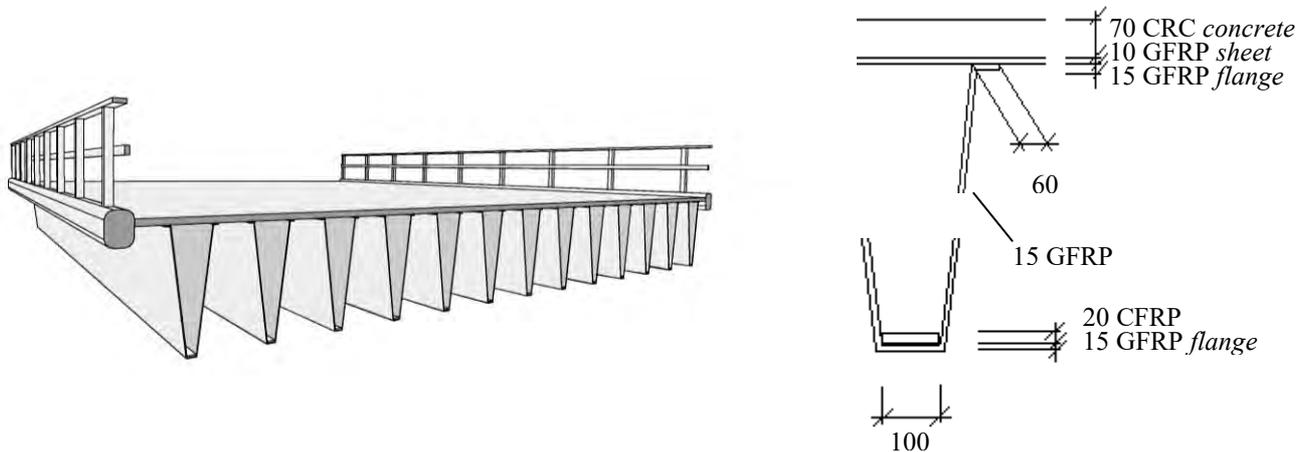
Outline of the *i-bridge* concept, a perspective sketch illustrating the major components of the bridge and to the right some details of the deck and the bottom of the beams (dimensions in mm).
